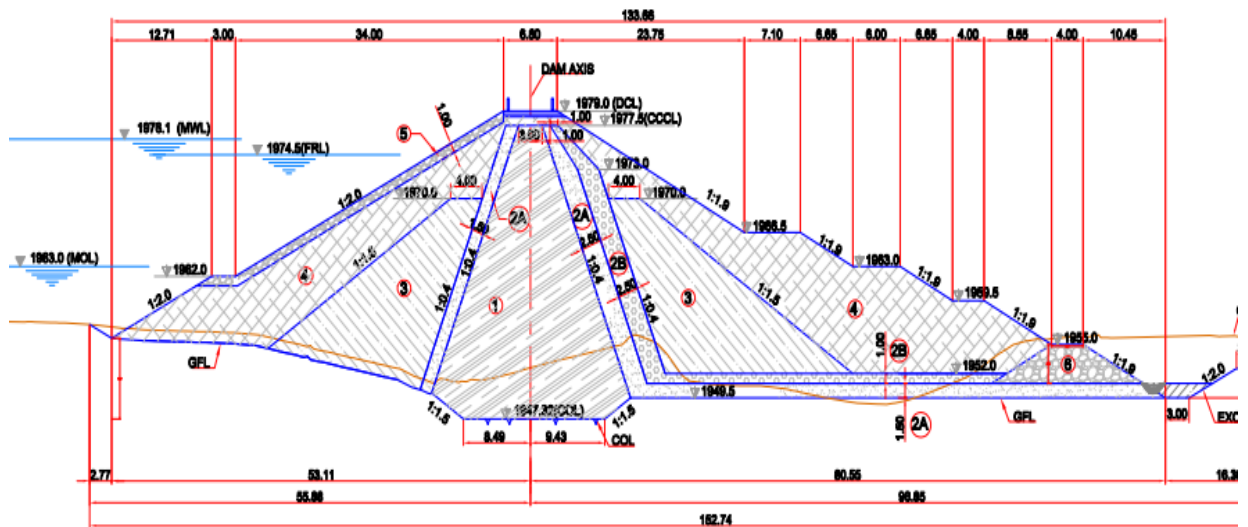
Dam Zoning for Zoned Earth-Rock Fill with Central Clay Core at Chainage 1+160 (at deepest cross section).
